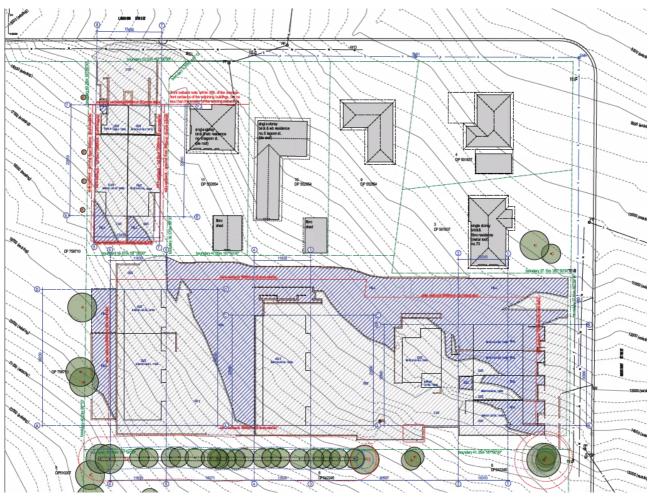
Extract from the Cut & Fill & Retaining Wall plan showing retaining walls (brown) and areas of proposed cut (grey hatching) and fill (blue hatching) (Source: Kennedy Associates)
